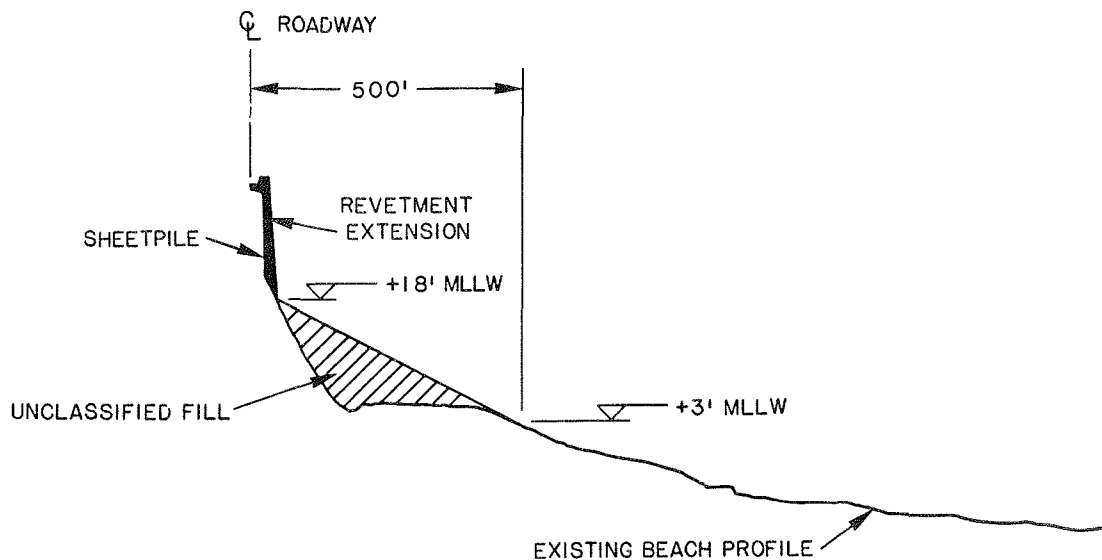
Typical cross section for Alternative 3 uniform beach fill with revetment extension
